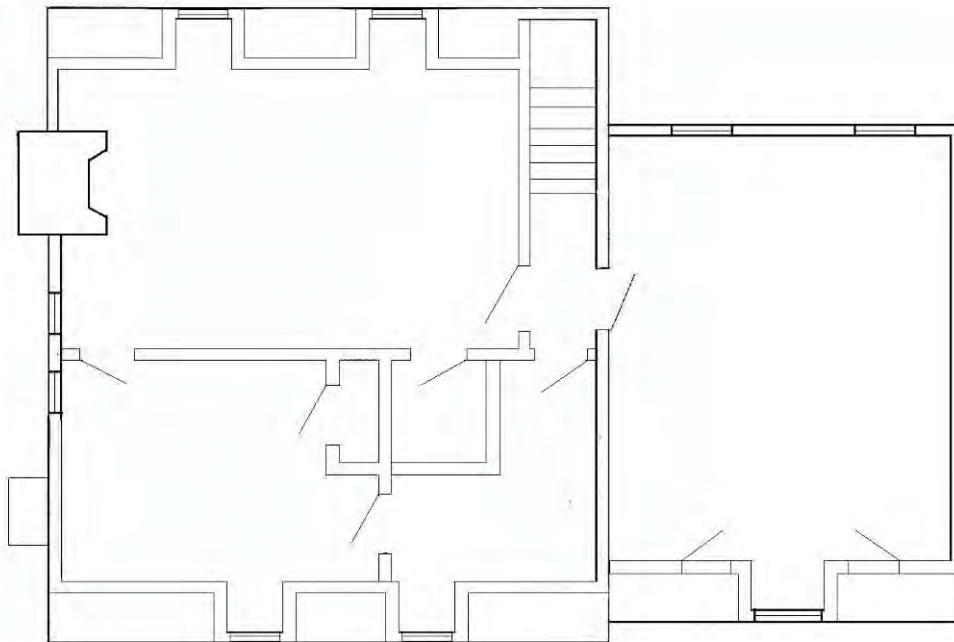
Current Layout as Created by the Murpheys circa 1955, Second Floor
